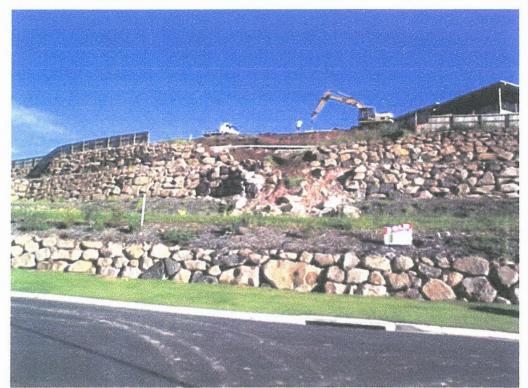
Retaining Wall Failure Bulwarra Place, Bilambil Heights
